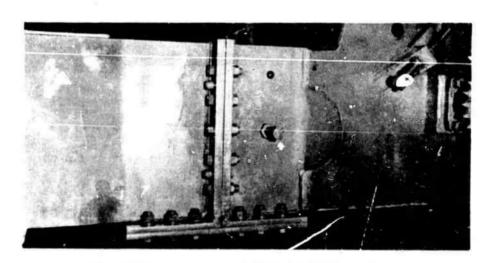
FINISHED JOINT (SECONDARY UNIT)
